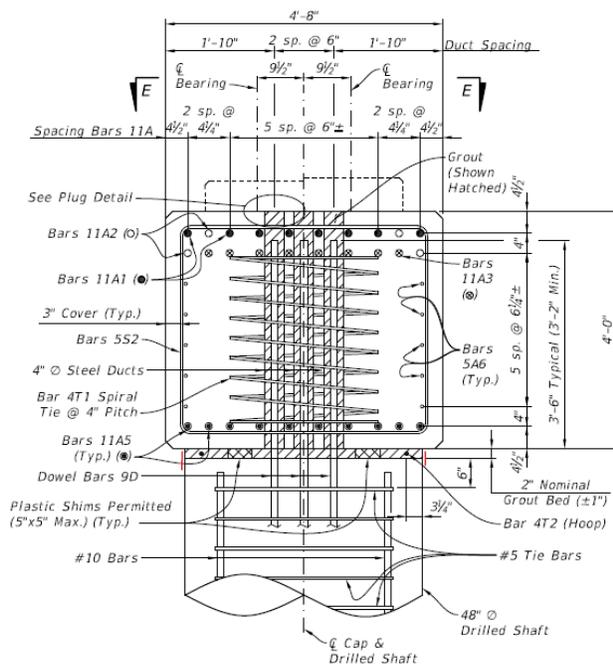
Typical section of precast intermediate bent cap at grouted duct connection (US 90)
